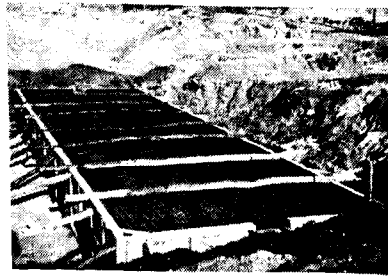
Capping slab over wells. Reinforcement and shuttering can be seen
